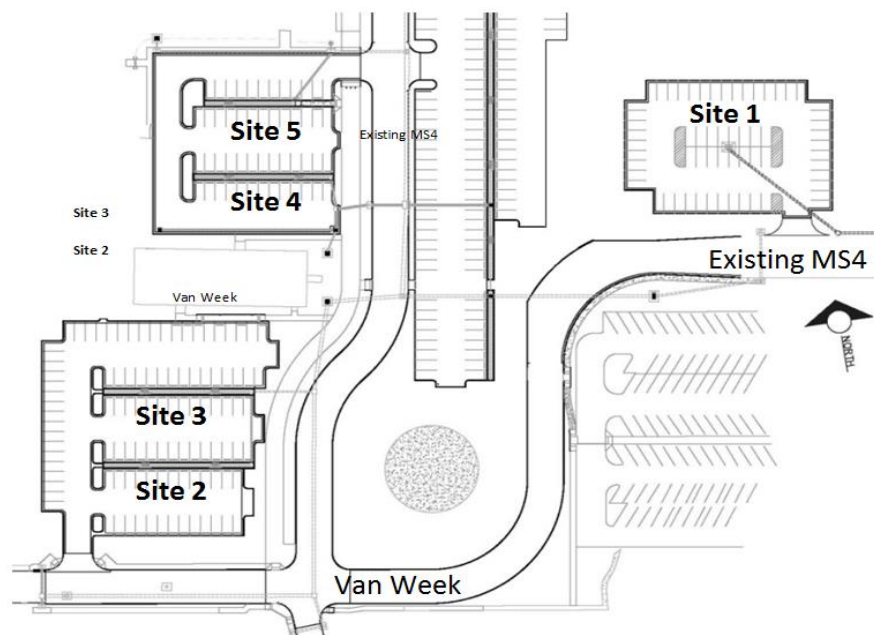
Bioswale parking lots located North of Van Week Street in UTRGV campus
